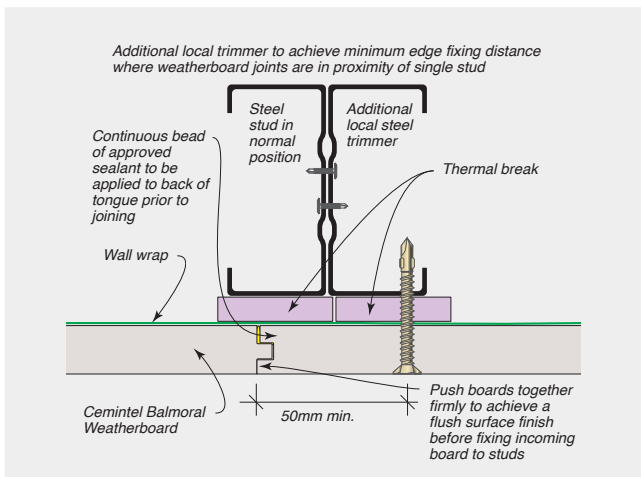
Typical Vertical Joint Aligned to Steel Stud with Local Trimmer
